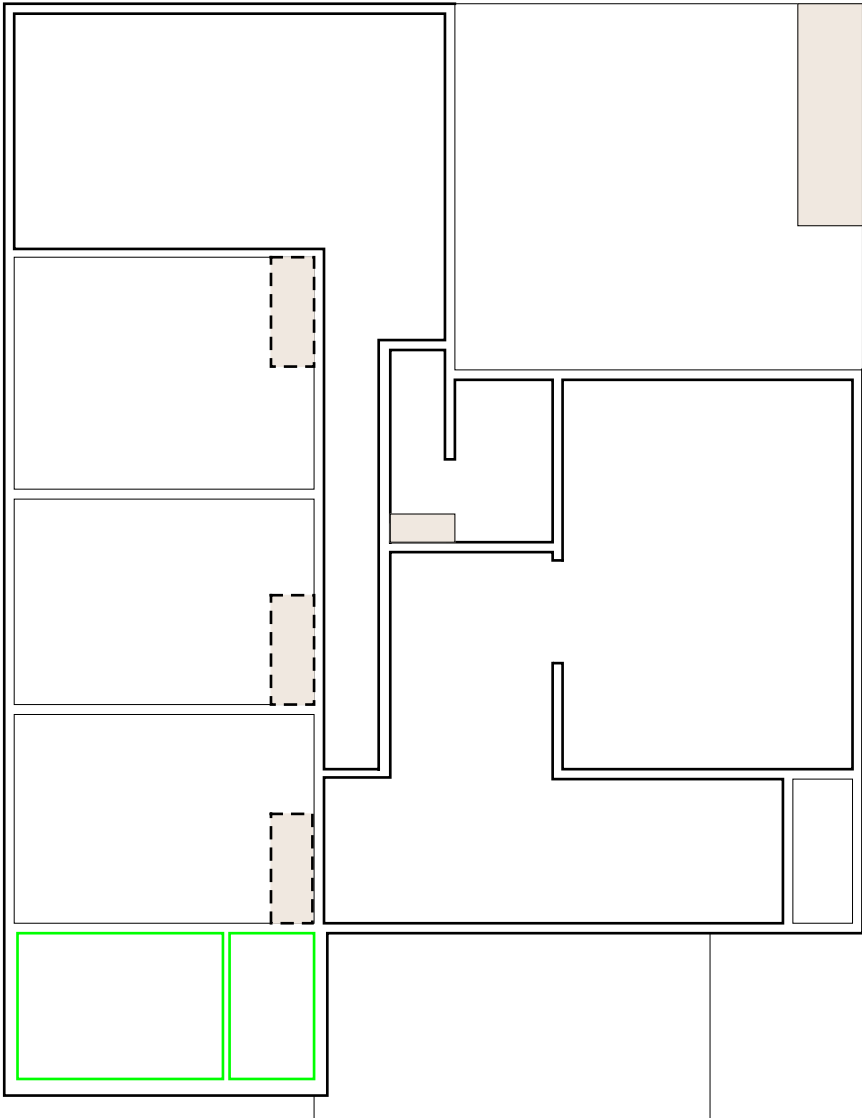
Plan view of existing house (black, with closets in darker shade), including part of wooden deck that will remain and carport (light gray outlined exterior parts) and addition to south (bottom of drawing). See variance application for maximum dimensions of the addition.
